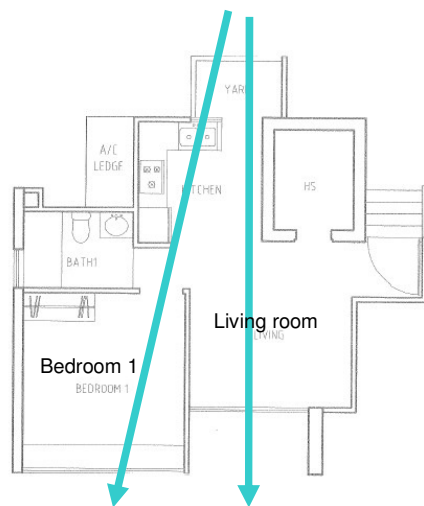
Dwelling unit layout showing that both living room and bedroom 1 are considered to have true cross ventilation and meet the requirement 1-2(a)(ii)
